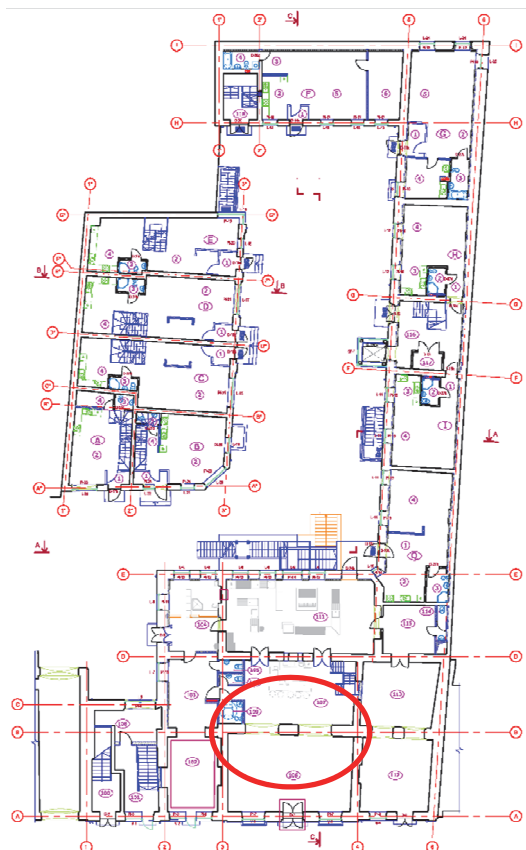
Positioning of the wall object of the modification in the horizontal section of the ground floor
